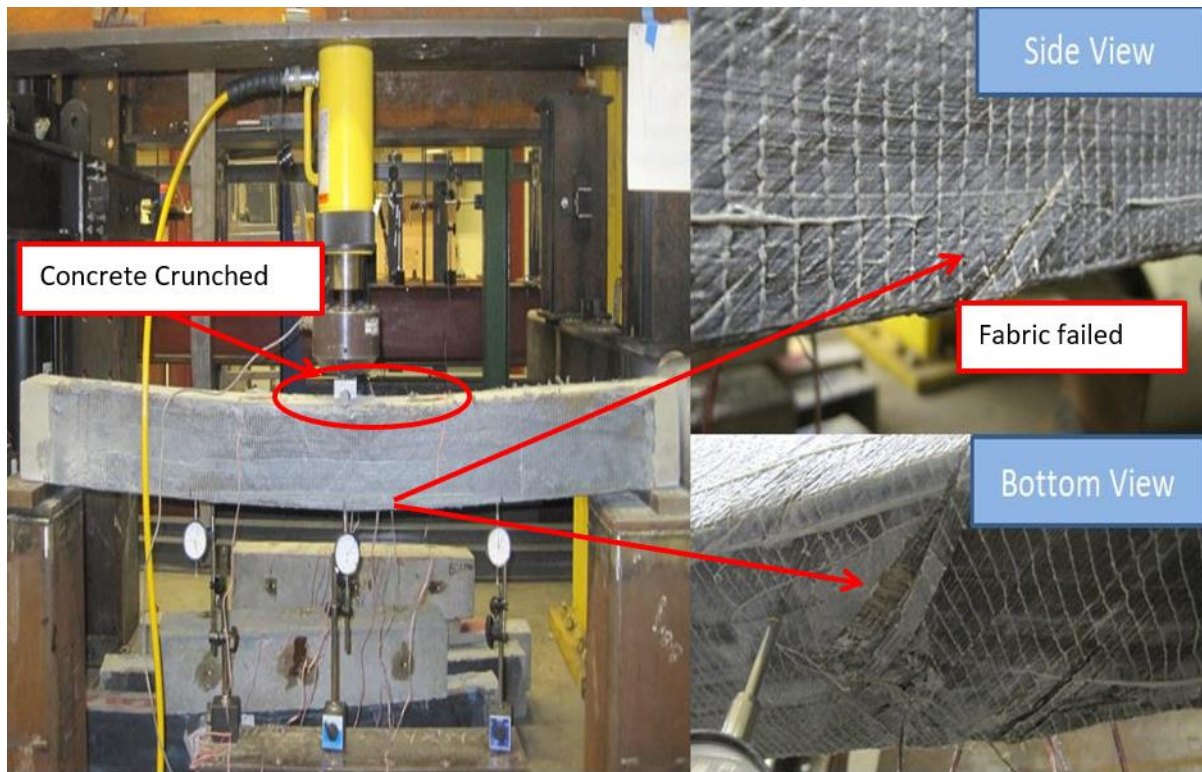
Crack Pattern of Specimen S-1 (retrofitted)
